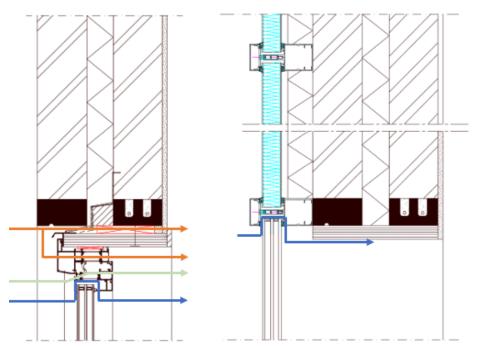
Airflow through current connections (left) and air flow through renovated façade (right)
